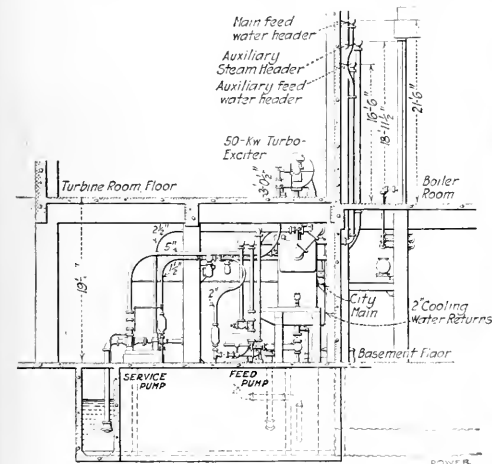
END ELEVATION OF AUXILIARY PIPING
